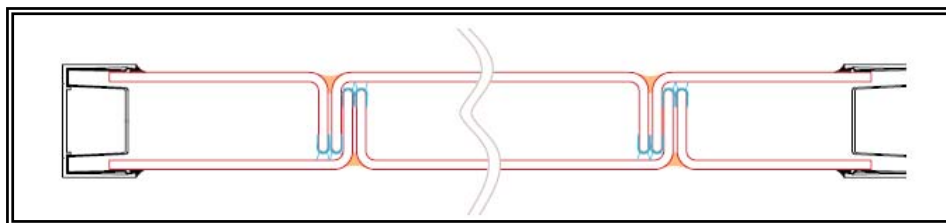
Figure IV: Pilkington Profilit Channel Glass System Horizontal Cross-Section
